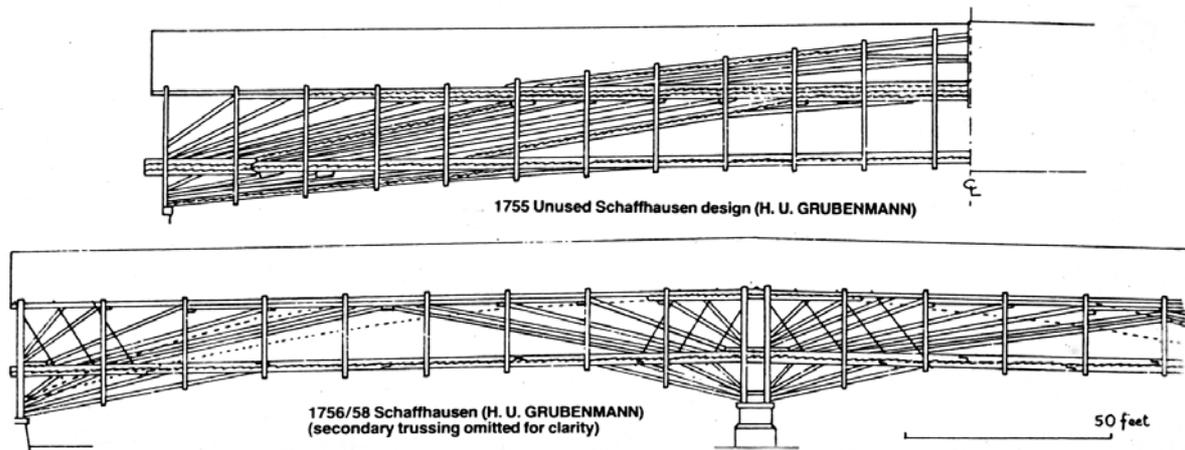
Schaffhausen Bridge, H.U. Grubenmann. (a) First proposal for single span through-truss of 119 m (390 ft), 1755. (b) As built, two span through truss with spans of 59 m (193 ft) and 52 m (171 ft), 1756-58. (James²)
